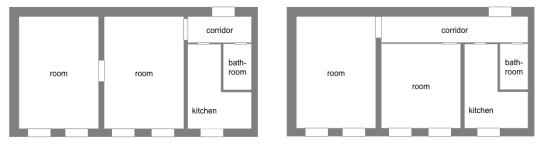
Floor plans with and without walk-through room. Source: Own illustration.
